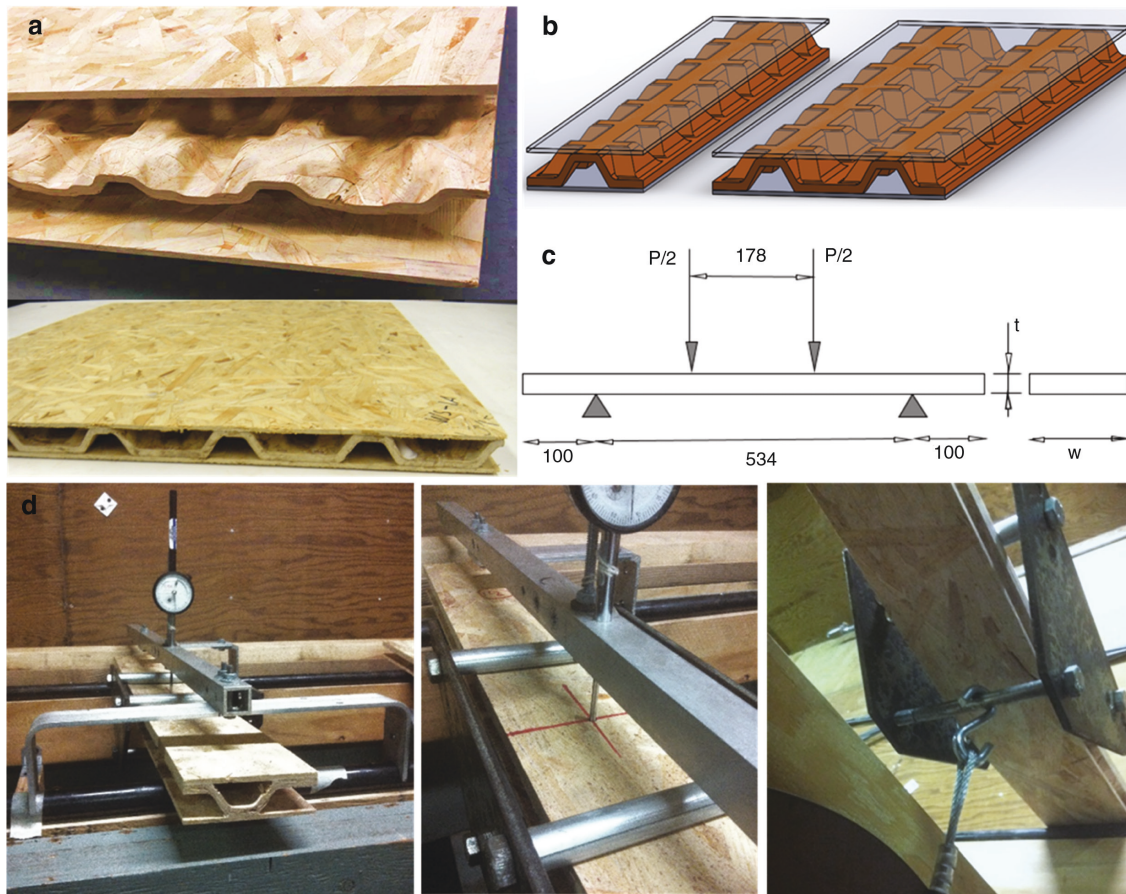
W-SSP construction details, test specimen configurations, and bending creep test set-up: (a) W-SSP and its components, (b) schematic configuration of narrow and wide specimens, (c) loading configuration (dimensions in mm) and (d) flexure set-up of creep test.
